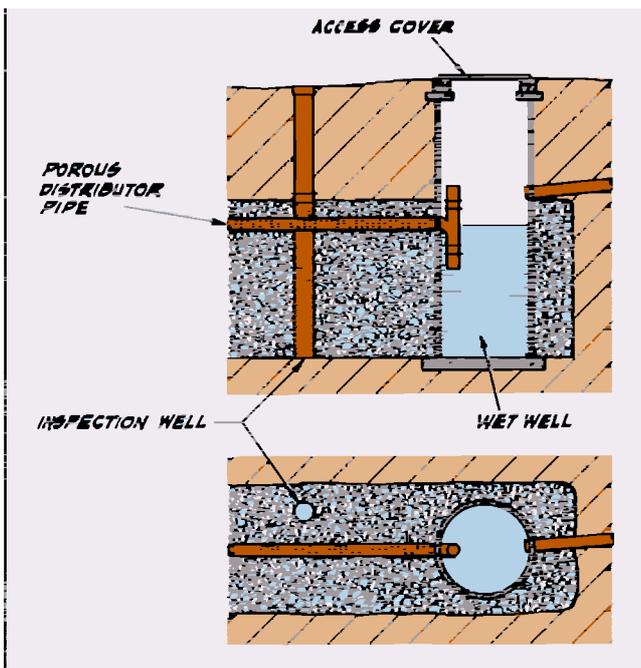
Trench-type soakaway with large wet well equipped with T-piece overflow to porous distributor pipe and separate inspection well
